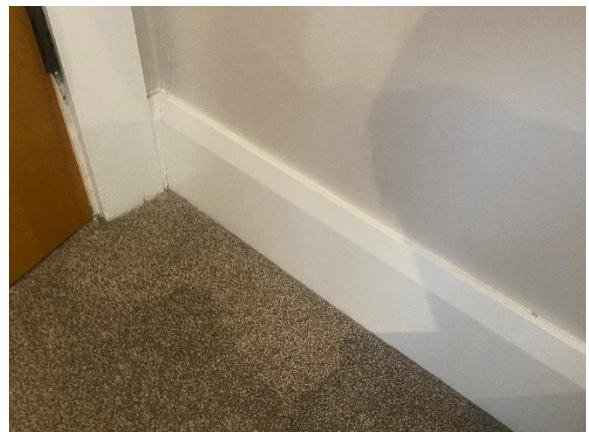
Later skirting on wall section to be removed in Bedroom 3 (Source: Three + One Heritage, 26.08.24)
